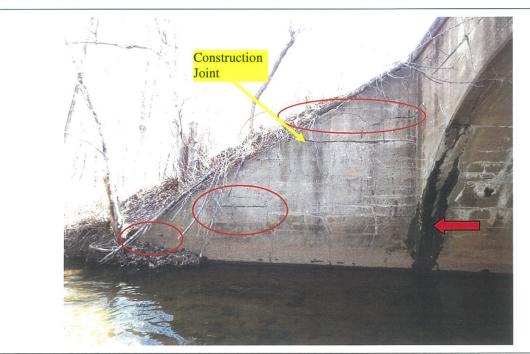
Medium to wide cracks (circles) at isolated locations of the northeast wingwall, looking east. Note tree growth behind the wingwall and active water leakage at northeast corner of the concrete arch (arrow).
